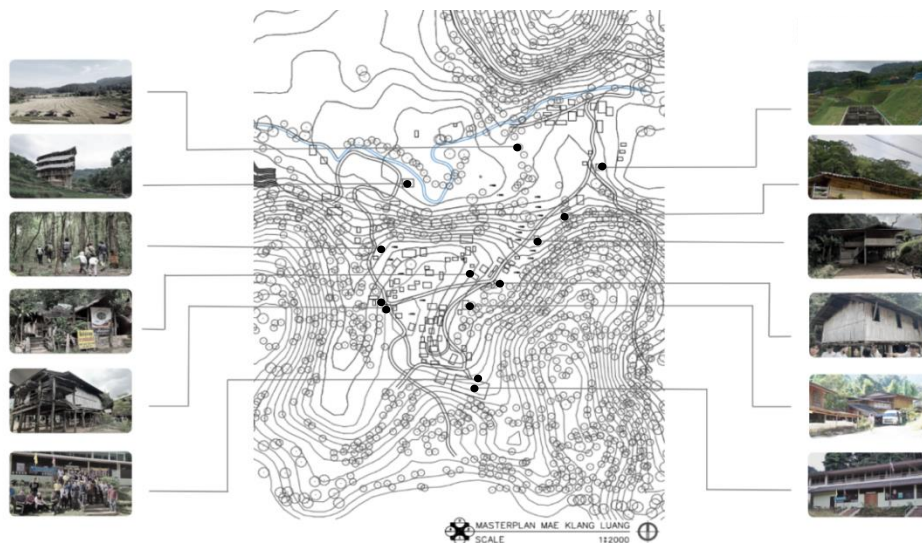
Landscape and buildings in Mae Klang Luang Residential Area
